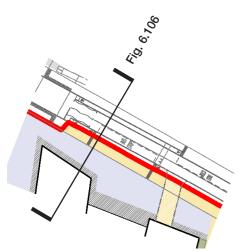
Street coding plan: along Cambridge Road (north of Plot K).
